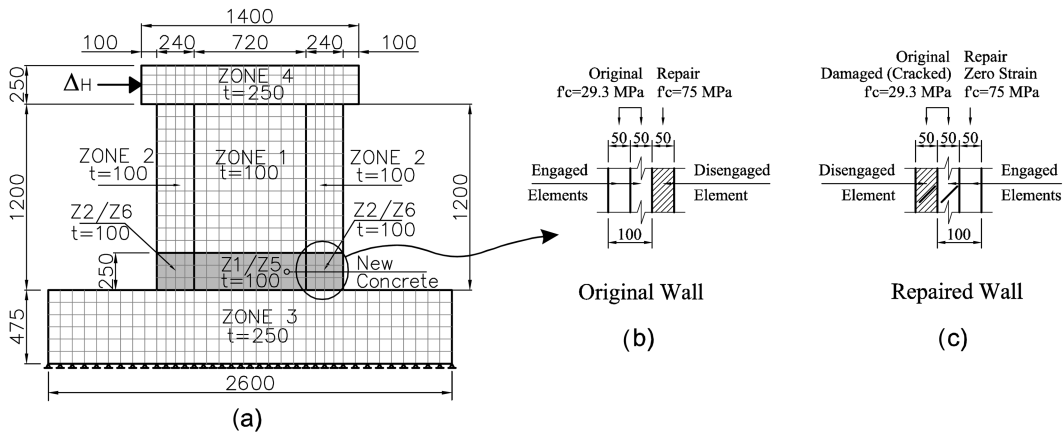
Finite element mesh of Walls LSW3/RLSW3: (a) meshing, (b) detail of partial replacement for original wall and (c) detail of partial replacement for repaired wall. All dimensions in mm
